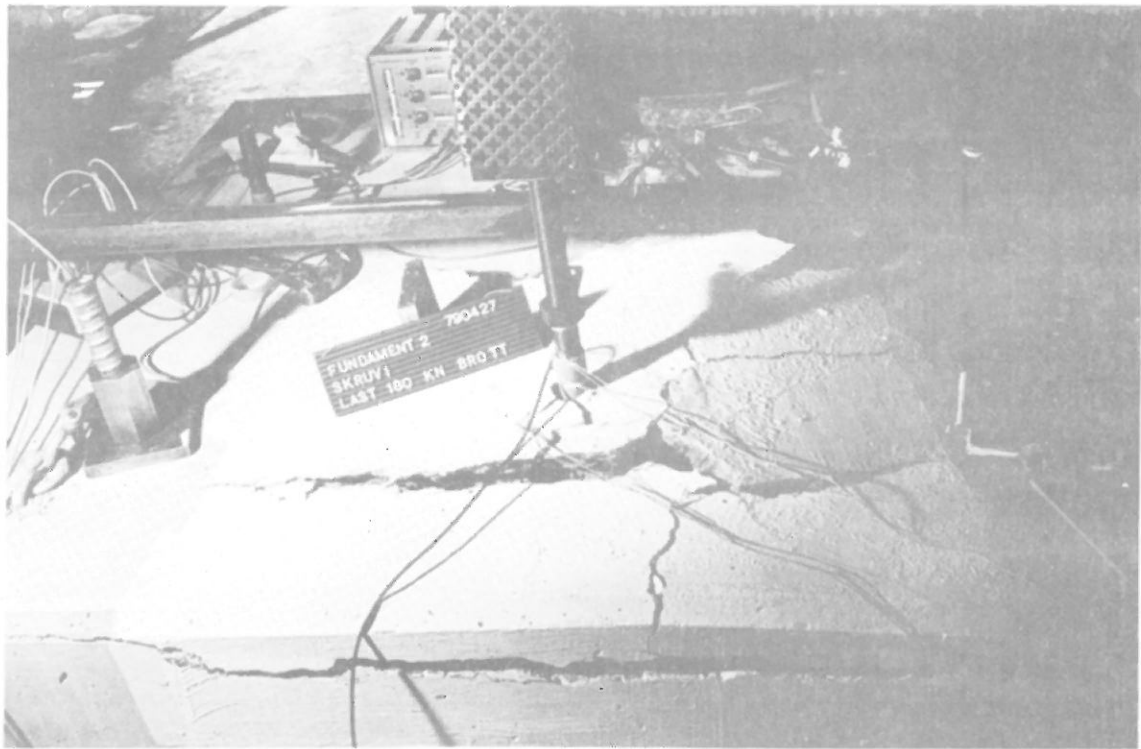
Anchor bolt SD 1:2 at failure (continued)
